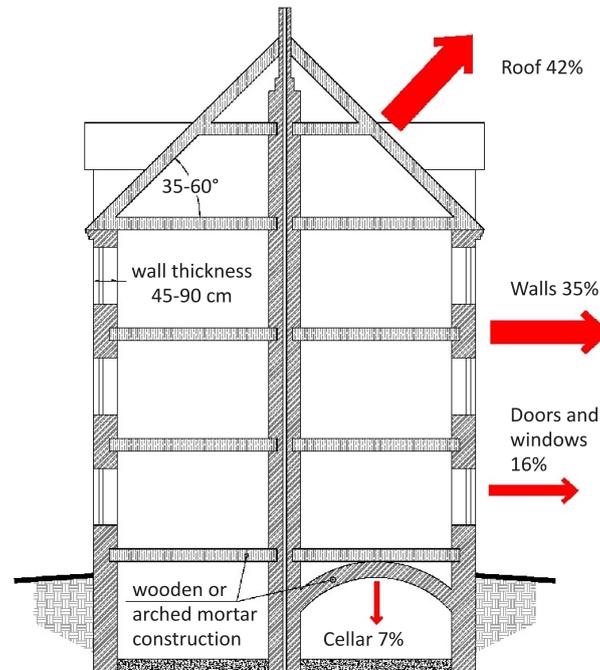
Typical historic brick building of Baltic sea region and average heat energy losses
